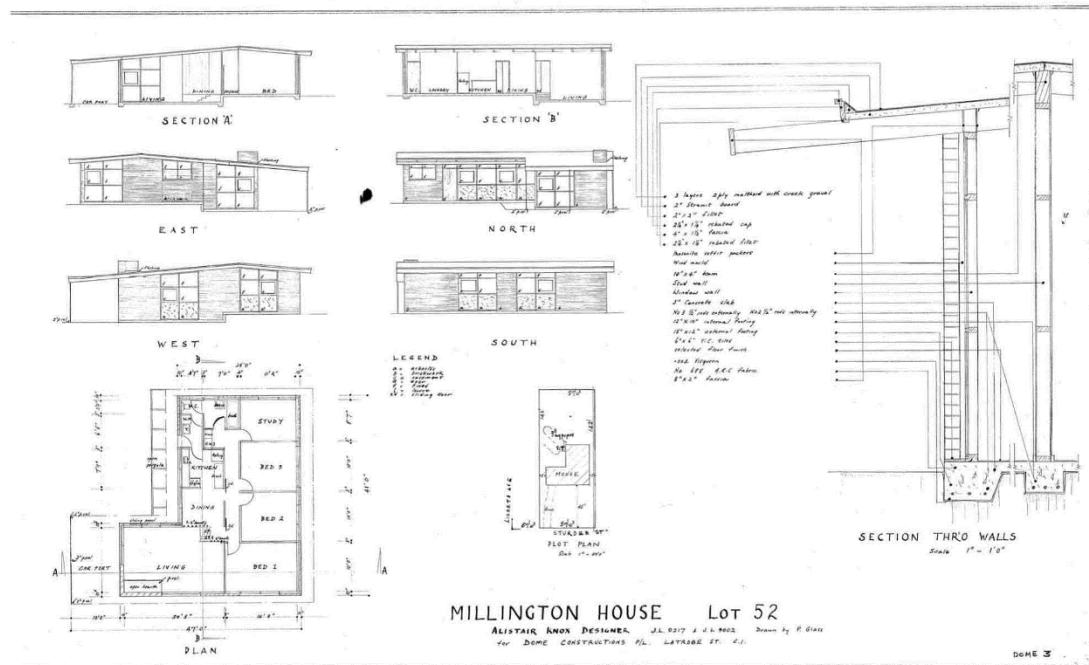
Millington House Lot 52 Sturridge road, Donvale [nd], Alistair Knox designer, drawn by P Glass (Alistair Knox Foundation) for Dome Construction. (Source: Alistair Knox Foundation)
